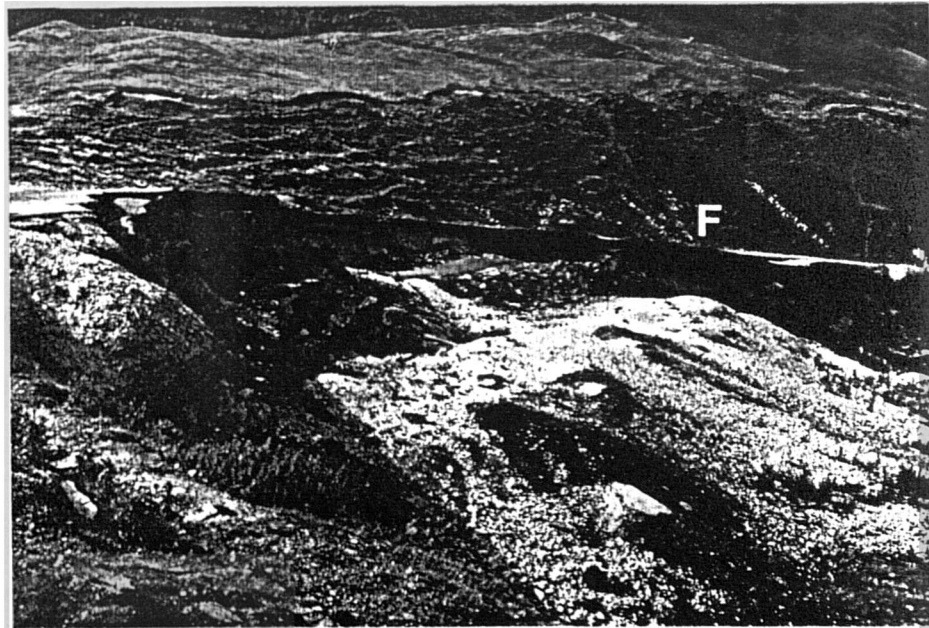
Damage at the upper road at Mam Tor. Note that successive layers of road surfacing material have been applied in an attempt to maintain the road. French drains on main unit of Mam Tor landslide 'F'.
